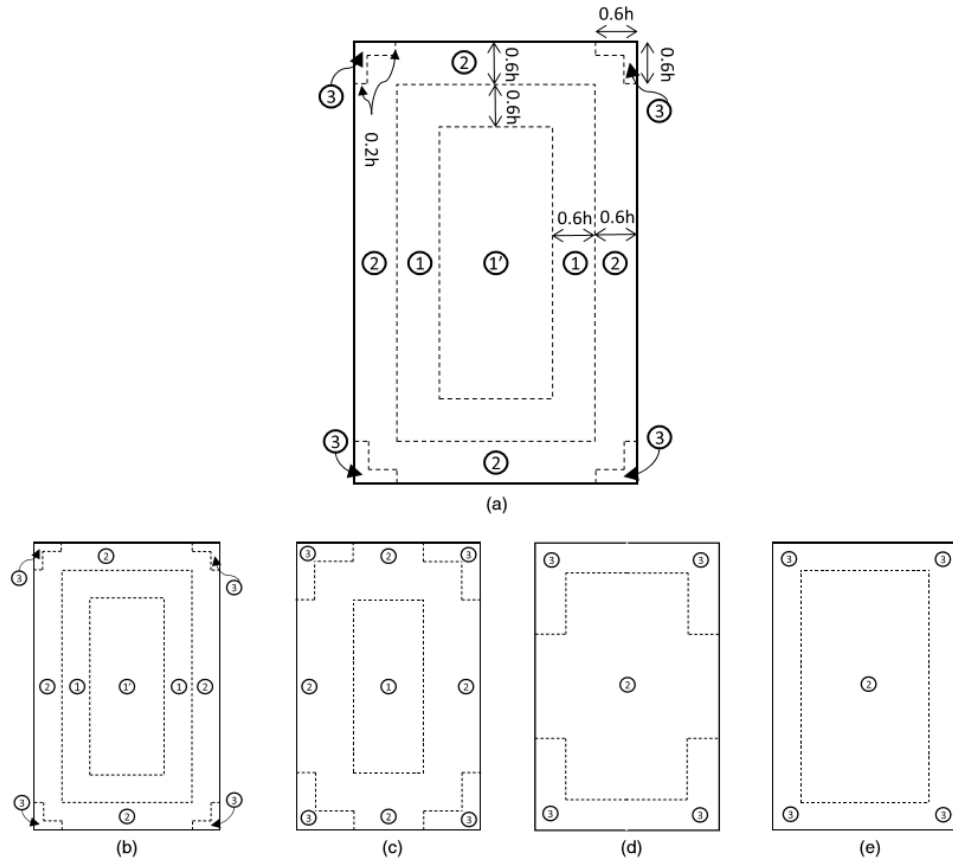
Diagram for Roof Zones regarding wind loads on components and cladding. Adapted from 'Component and cladding pressures and zones for the roofs of low-rise buildings.' (Kopp and Morrison, 2014)
